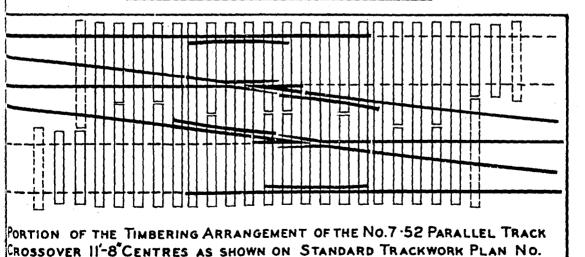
TIMBERING ARRANGEMENT - STANDARD TRACKWORK PLANS
